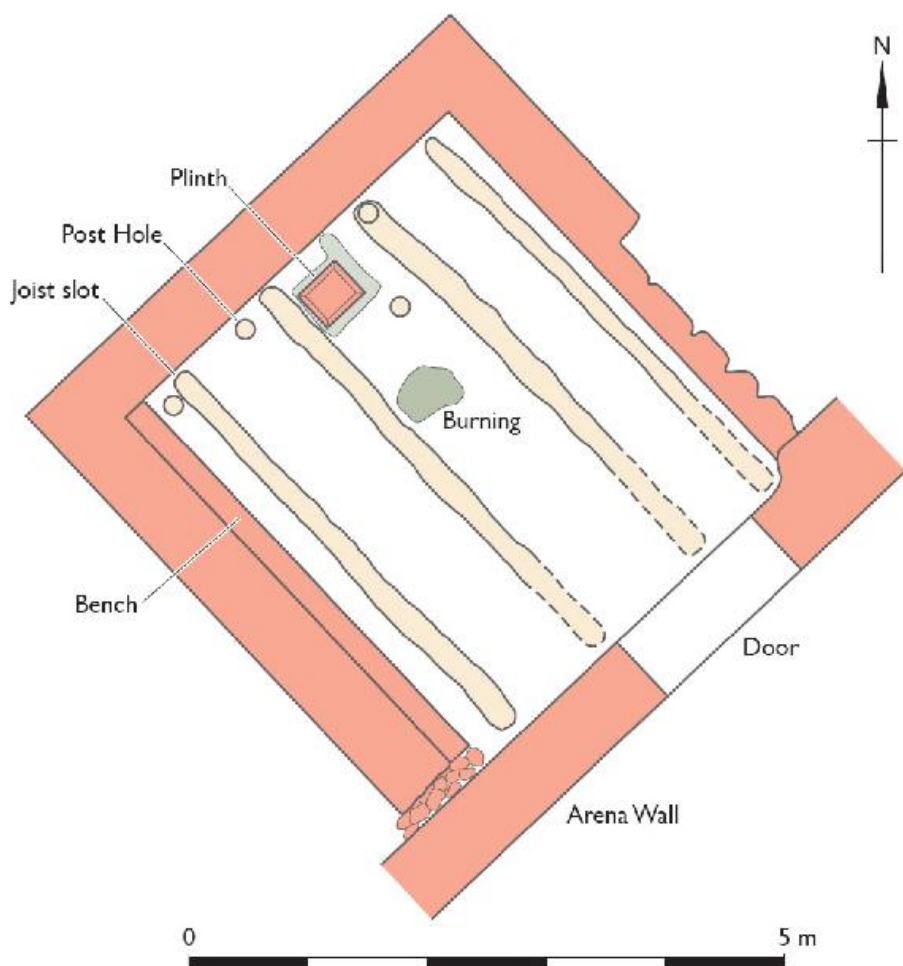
Nemeseum* floor plan showing joists (after Thompson).
